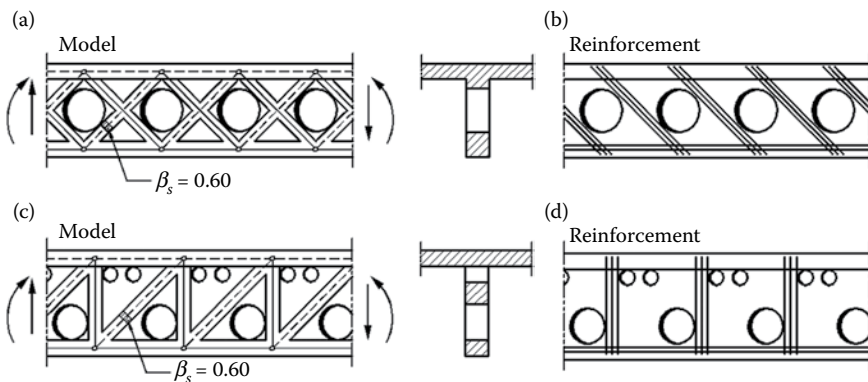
Beam with small web openings: (a, b) pattern 1 of openings and corresponding reinforcement detailing and (c, d) pattern 2 of openings and corresponding reinforcement detailing. (Adapted from Schlaich, J. and Schäfer, K., *Journal of the Structural Engineer*, 69(6), 1991, 113–125.)
